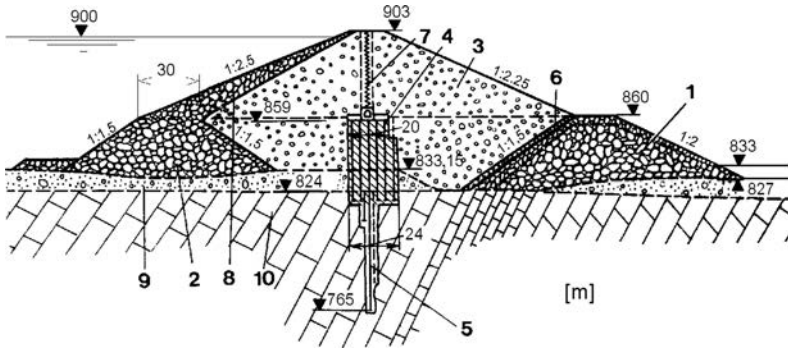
Atbashinskaya dam (Kyrgyz Republic) (after Grishin et al., 1979). (1) Rockfill; (2) rockfill into water; (3) gravel embankment; (4) grout concrete wall in the dam; (5) grout curtain in the foundation; (6) transition zone; (7) polyethylene concrete wall in sand; (8) rockfill; (9) alluvial deposit; (10) marbled limestone.
